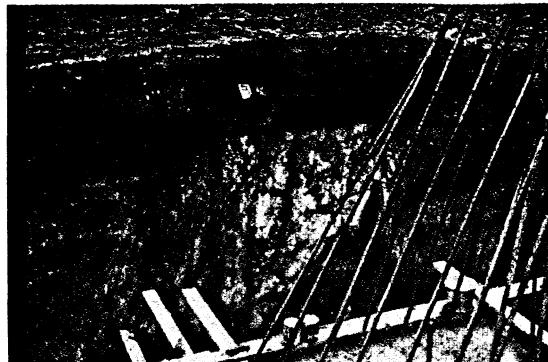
Concrete Foundation in Permafrost. Ice below Topsoil Layer Is Shown in Background
